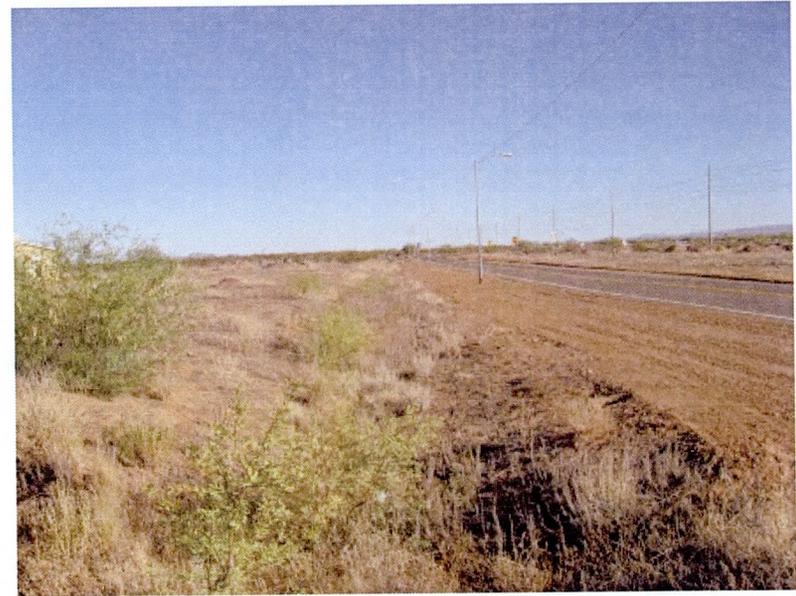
Looking NW at drainage ditch 20' bank-bank & 2' bottom at intersection of Old Happy Valley Road and Citrus Roads.
